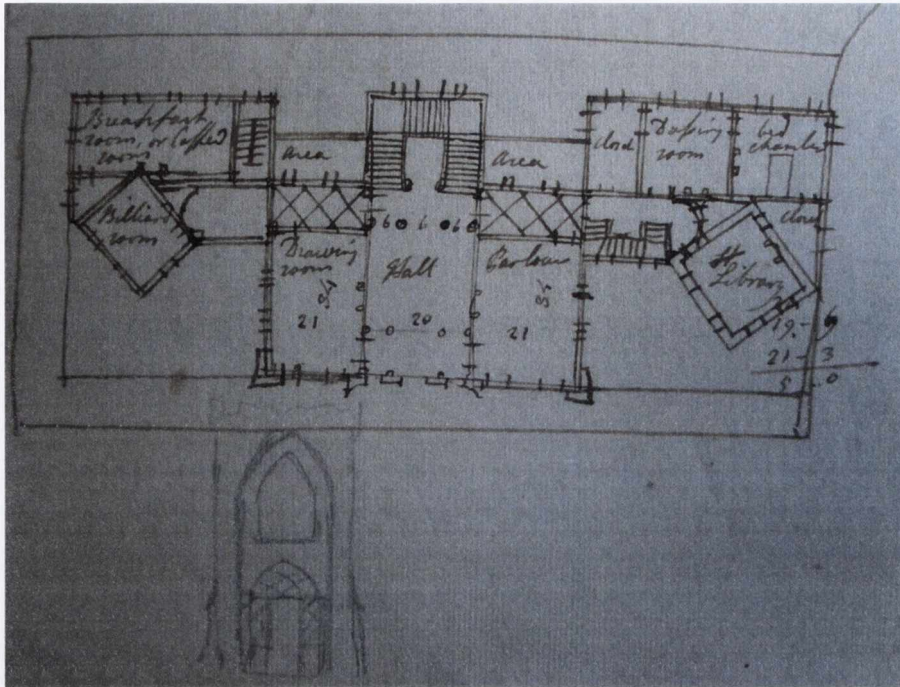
Birr Castle, proposed ground floor plan, attrib. to John Johnston, [1801], Rosse papers, O/17/4.
